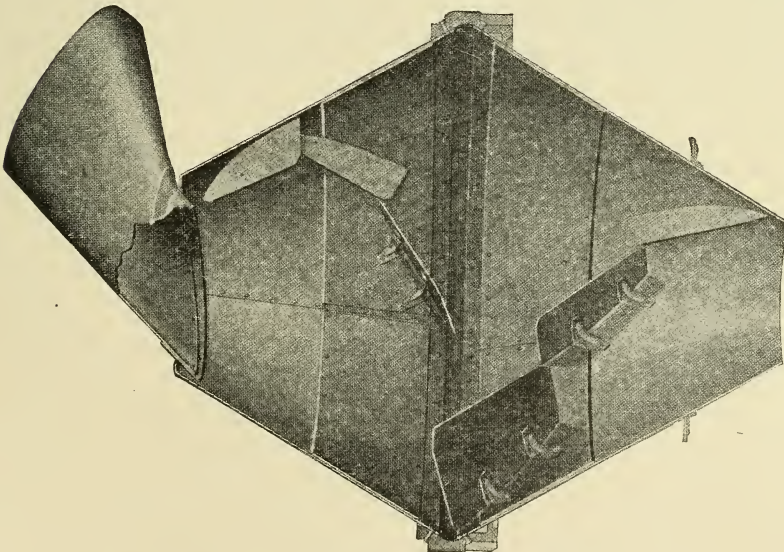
Cross-Section of Drum of Rotary Mixer (front half cut away), Showing Blades and Lining.
